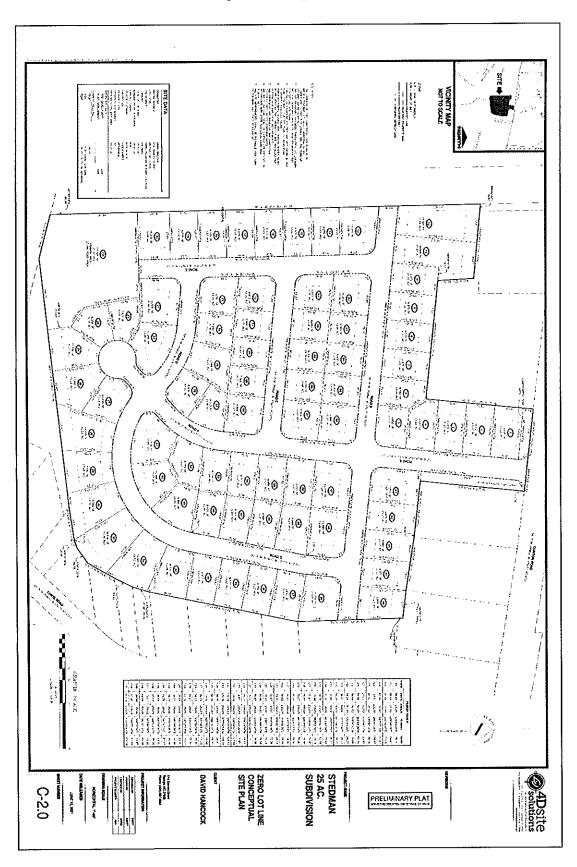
EXHIBIT "A" Case P21-31 Conditional Use Subdivision Plan
